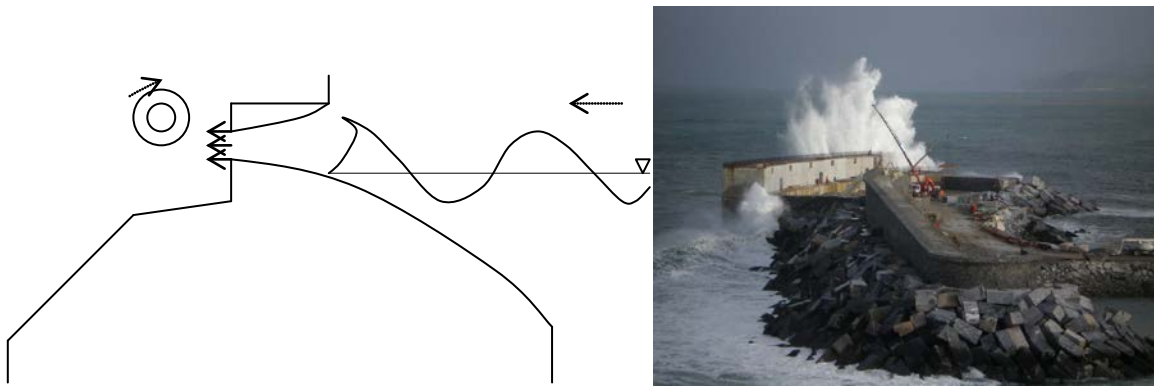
Breakwater-Blowjet and Breakwater in Mutriku, Spain [46]
